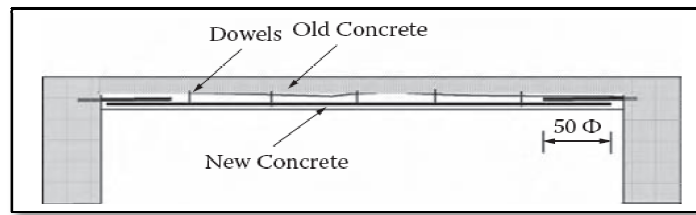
Steel Reinforcement Installation for Slab Repair (El-Reedy, 2008)
